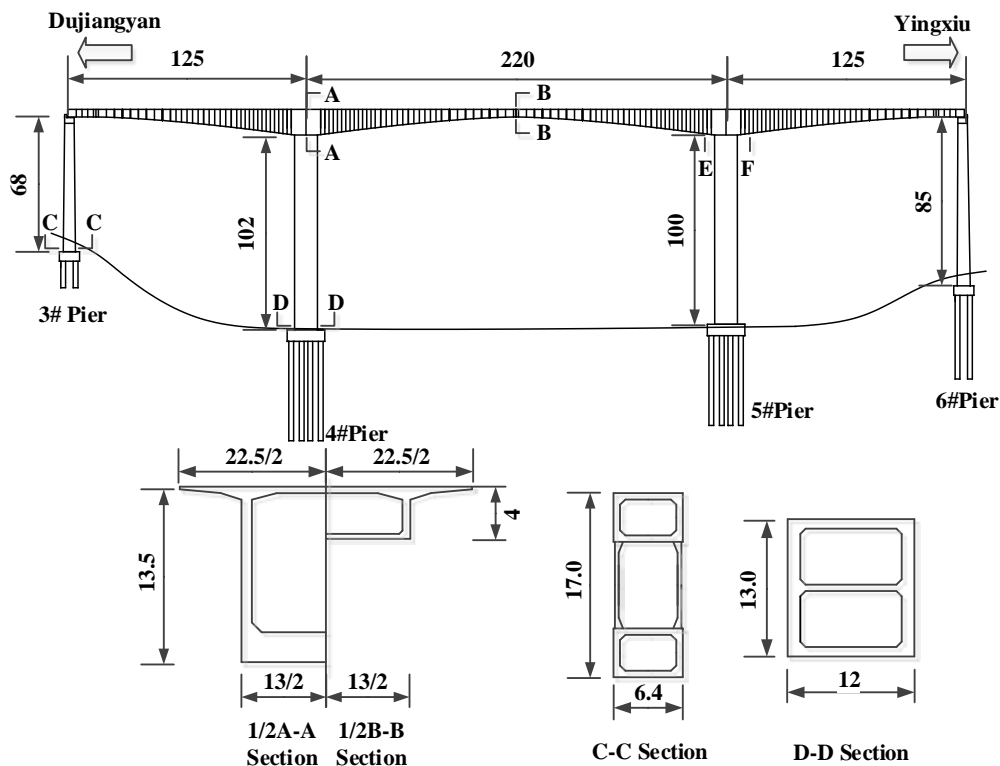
Arrangement of Bridge Span and Cross Section (unit: m)
